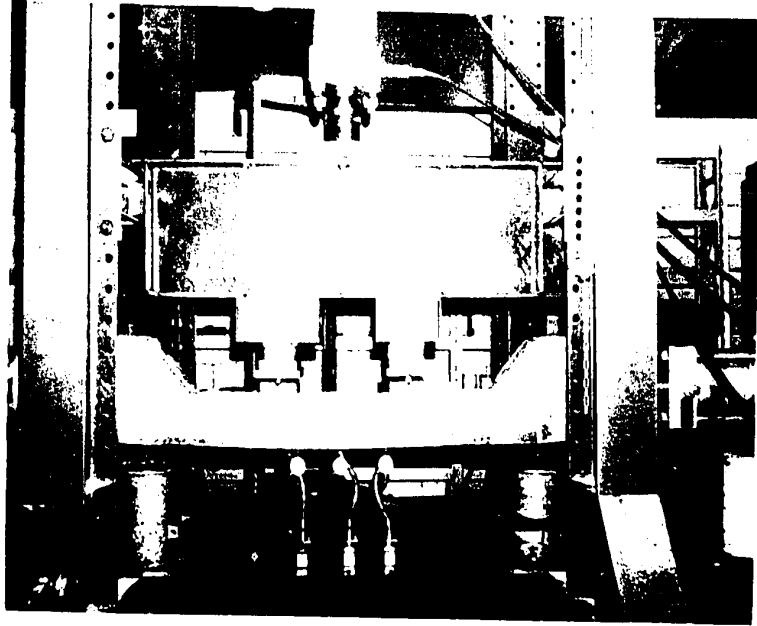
a) GENERAL VIEW OF TESTED SPECIMEN UNDER PURE BENDING
